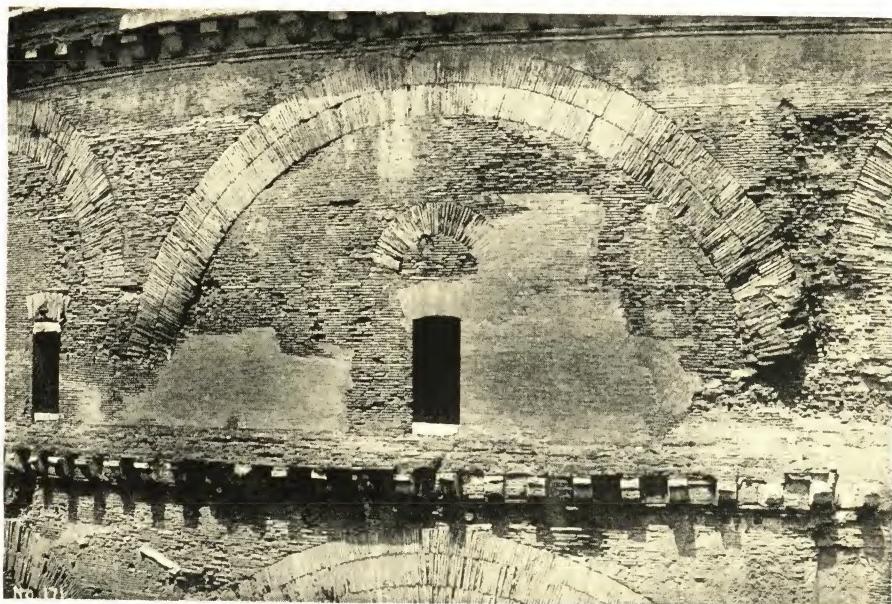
Great Relieving Arches in Wall of Pantheon, Rome.
